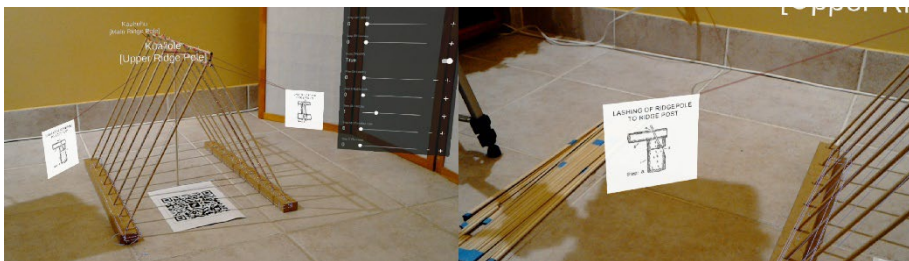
Lashing Instructions of Pou Hana (Ridge Post) and Kauhuhu (Ridge Pole)
